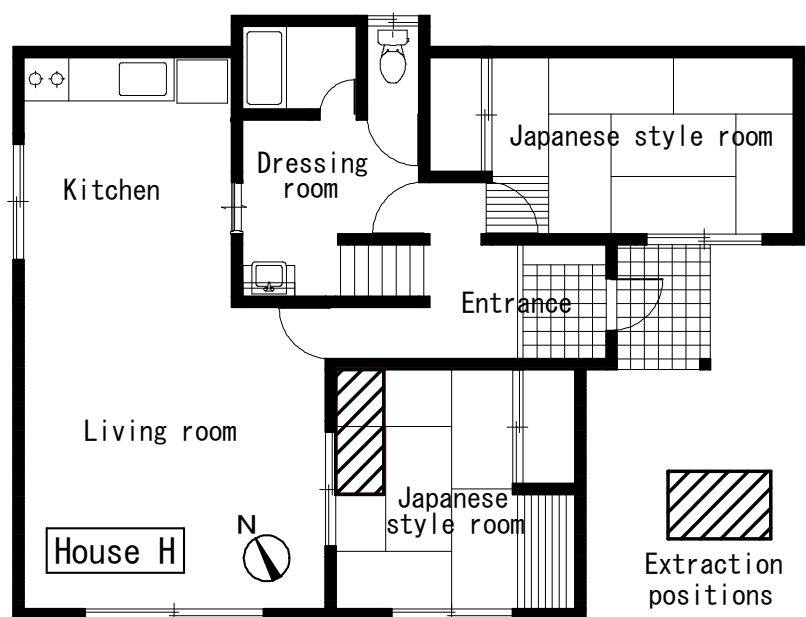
Examples of first-floor plans and extraction positions of the used plywood in investigated houses.
